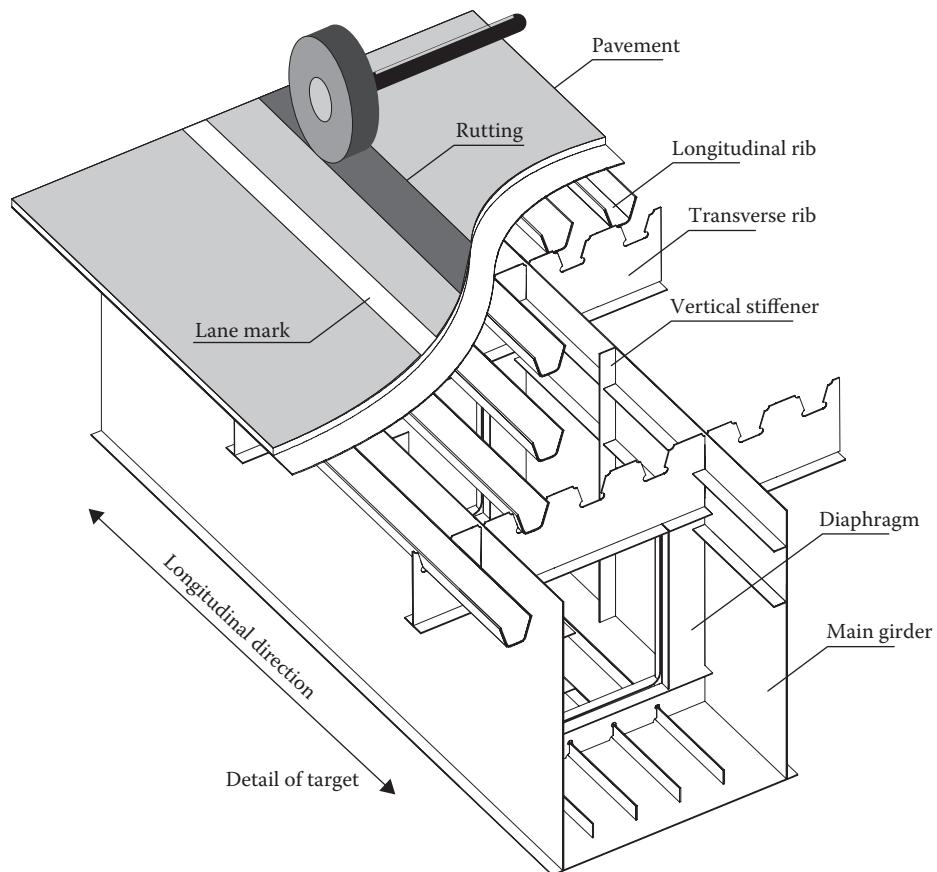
General structure of box section girder with orthotropic steel bridge decks.
